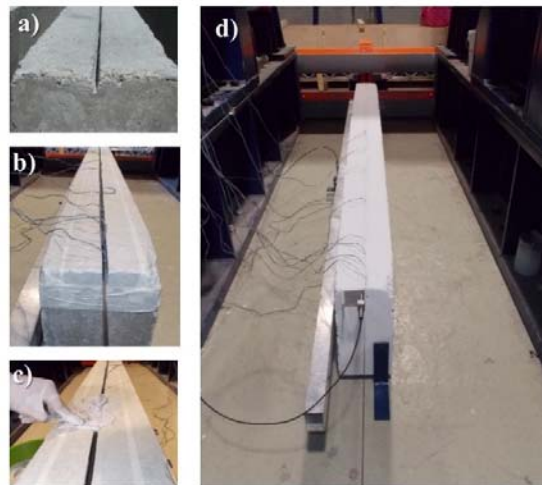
NSM CFRP prestressing procedure: a) opening the groove, b) placing laminate into groove and prestressing, c) filling the groove with epoxy, d) releasing the prestress force
